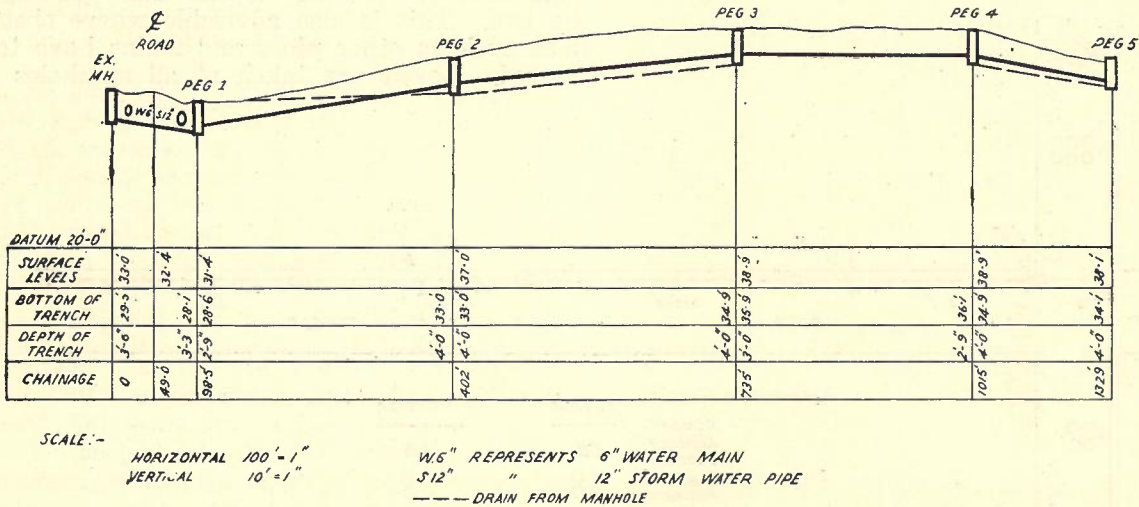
Typical Longitudinal Section showing Levels for Conduits.
